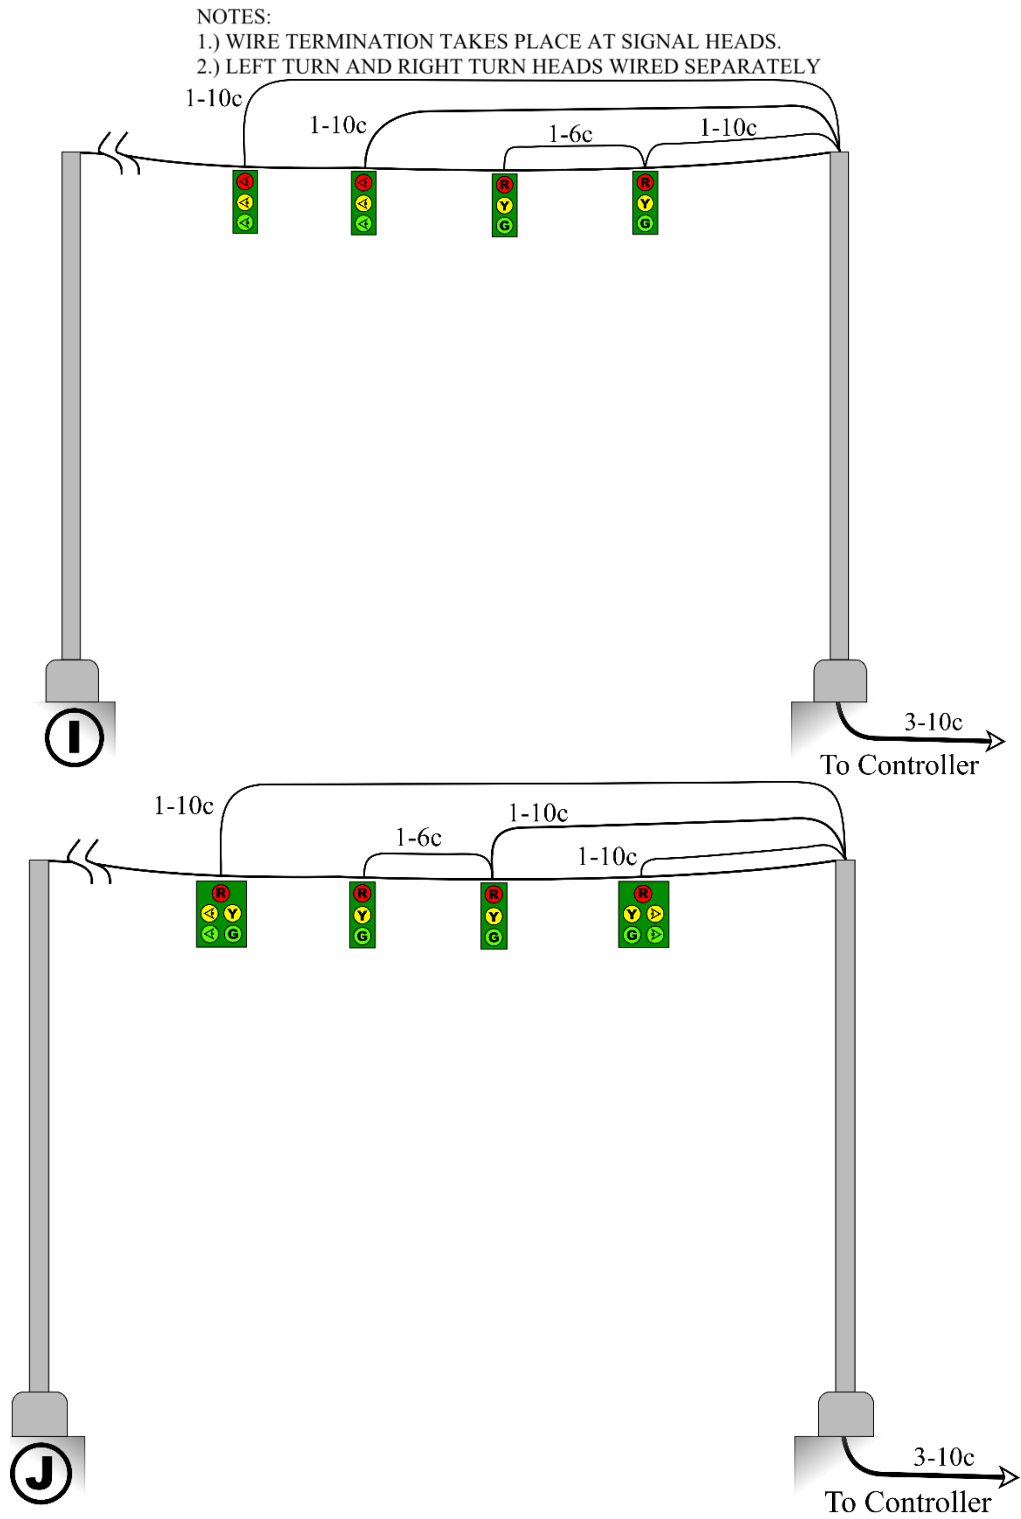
Typical Span Wire Signal Wiring: Examples I & J
